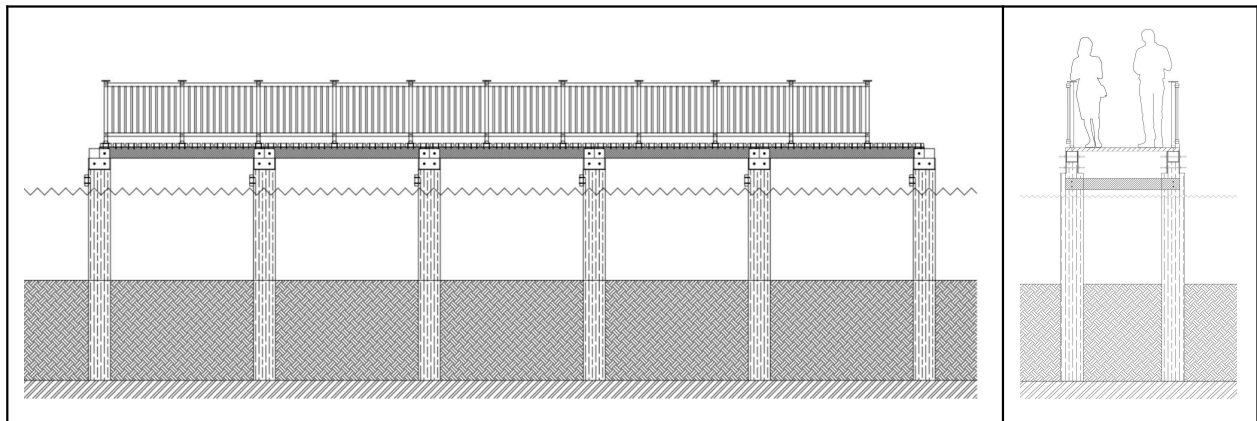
Final Design Elevation View (Left) & Section View (Right)
